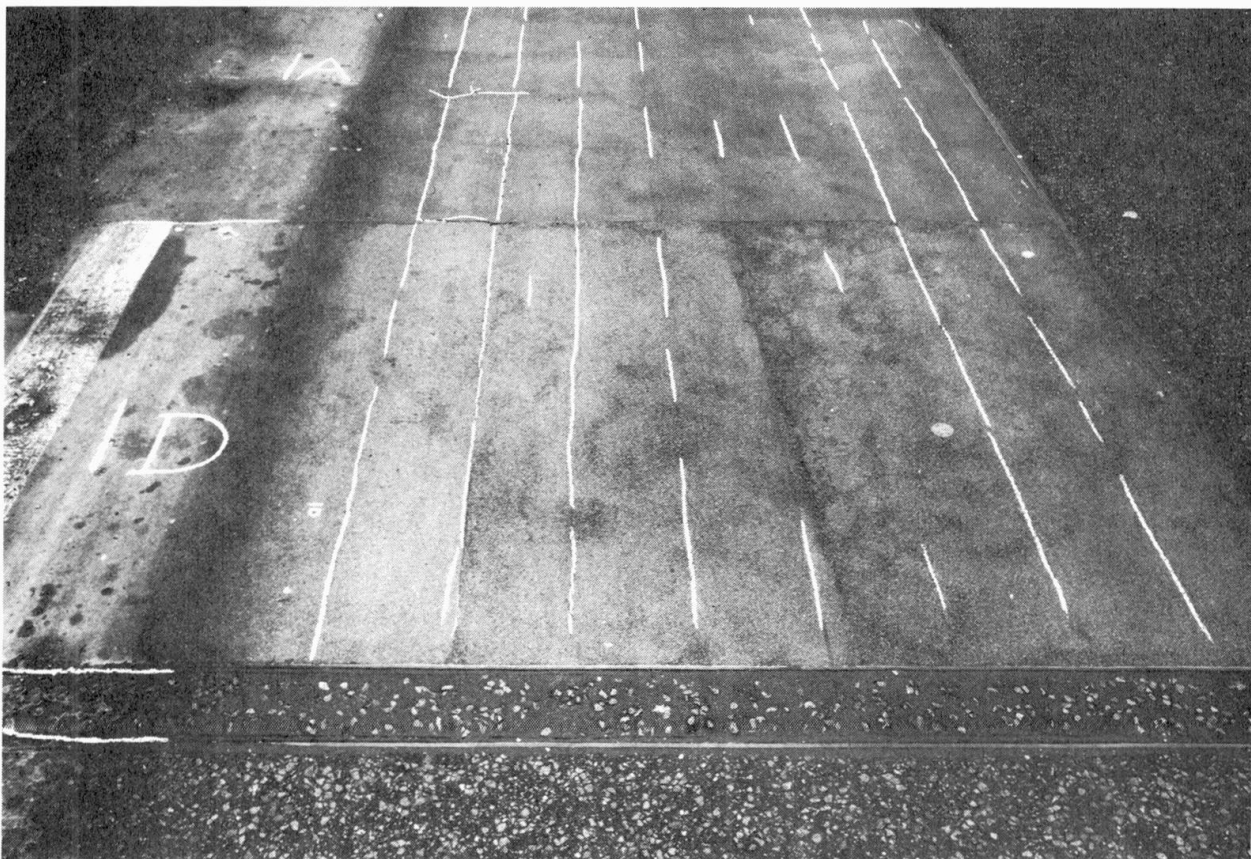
CRACKING IN "ESTERCRETE" SURFACING ON SECTION 1D, NOVEMBER, 1967
